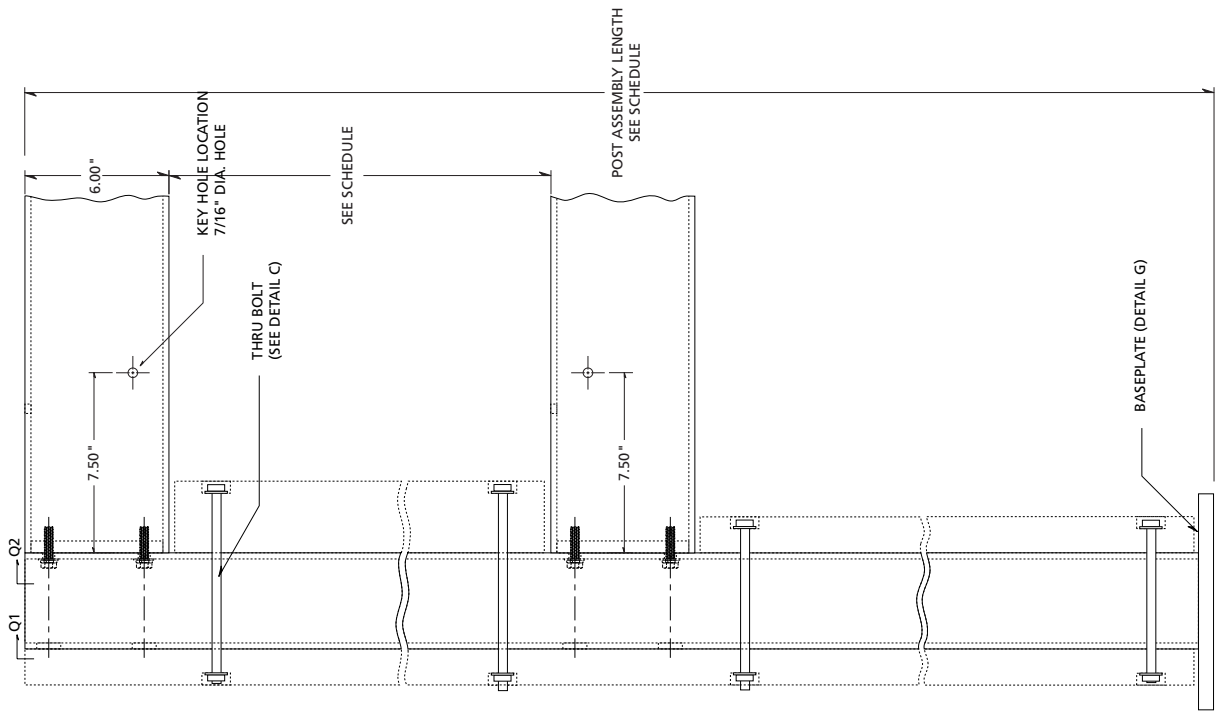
DETAIL POST ASSEMBLY 6 x 4 PLAN VIEW
